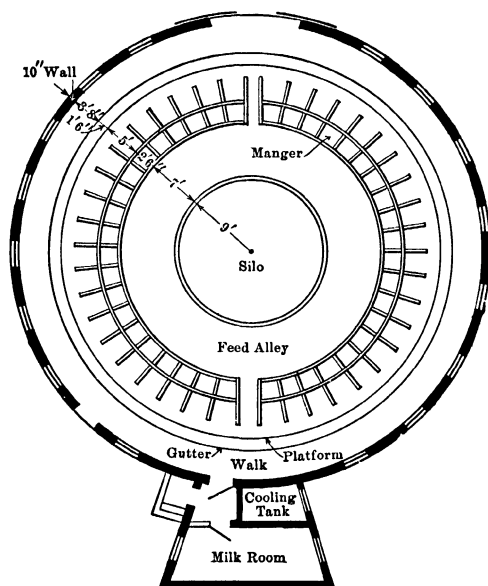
Floor plan of round barn for forty cows. (Ill. Exp. Sta.)
